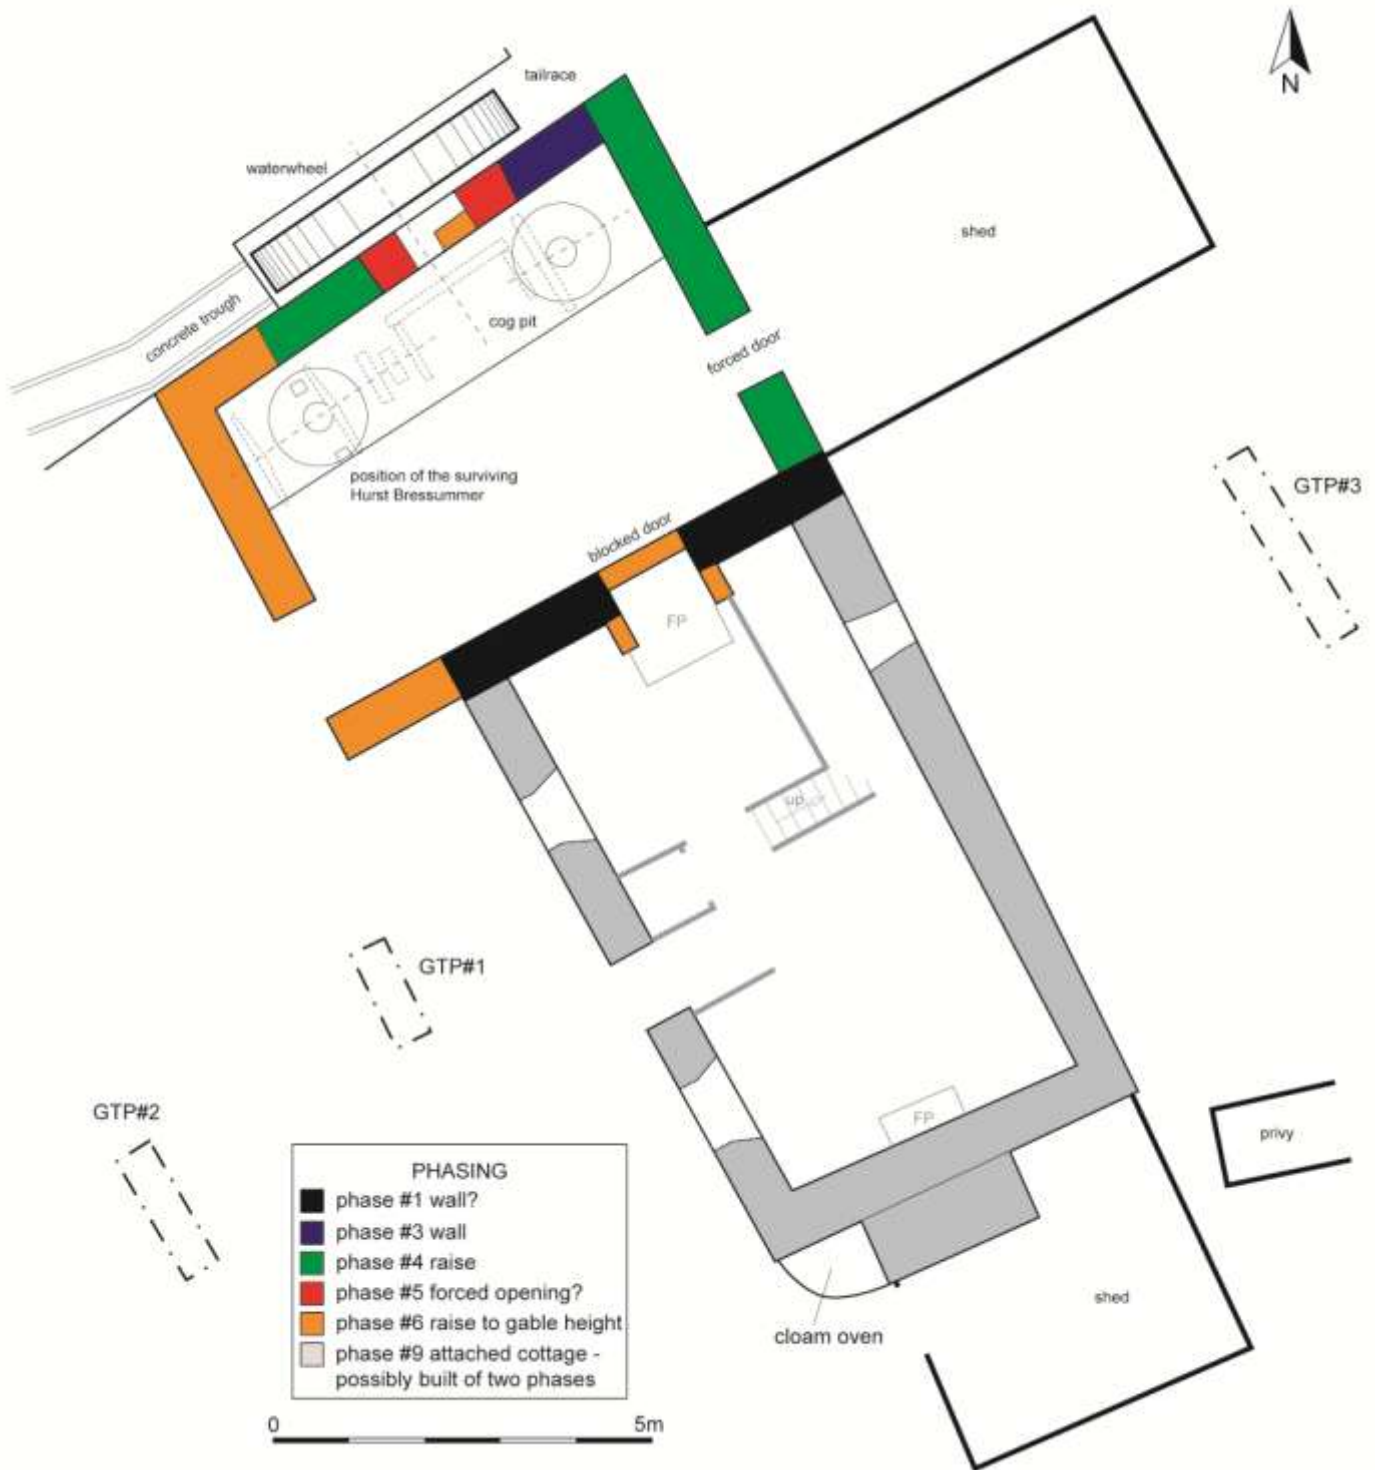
Phased ground-floor plan showing a reconstruction of the mill machinery. Schematic plan based on existing architect's drawings.
